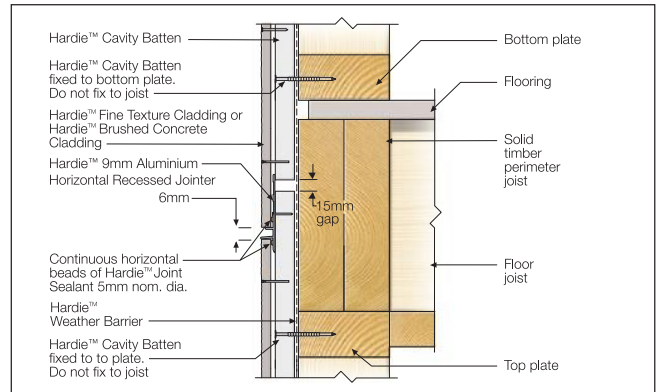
FLOOR LEVEL JUNCTION HORIZONTAL RECESSED JOISTER OPTION
